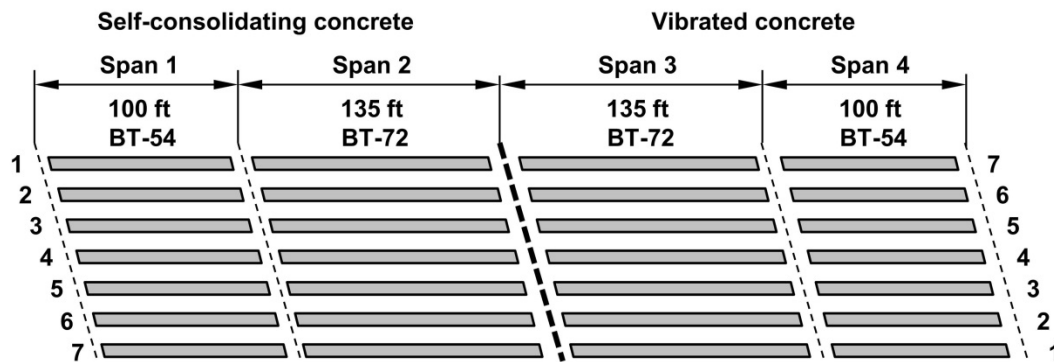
SCC and VC girders placed in the bridge over Hillabee Creek
